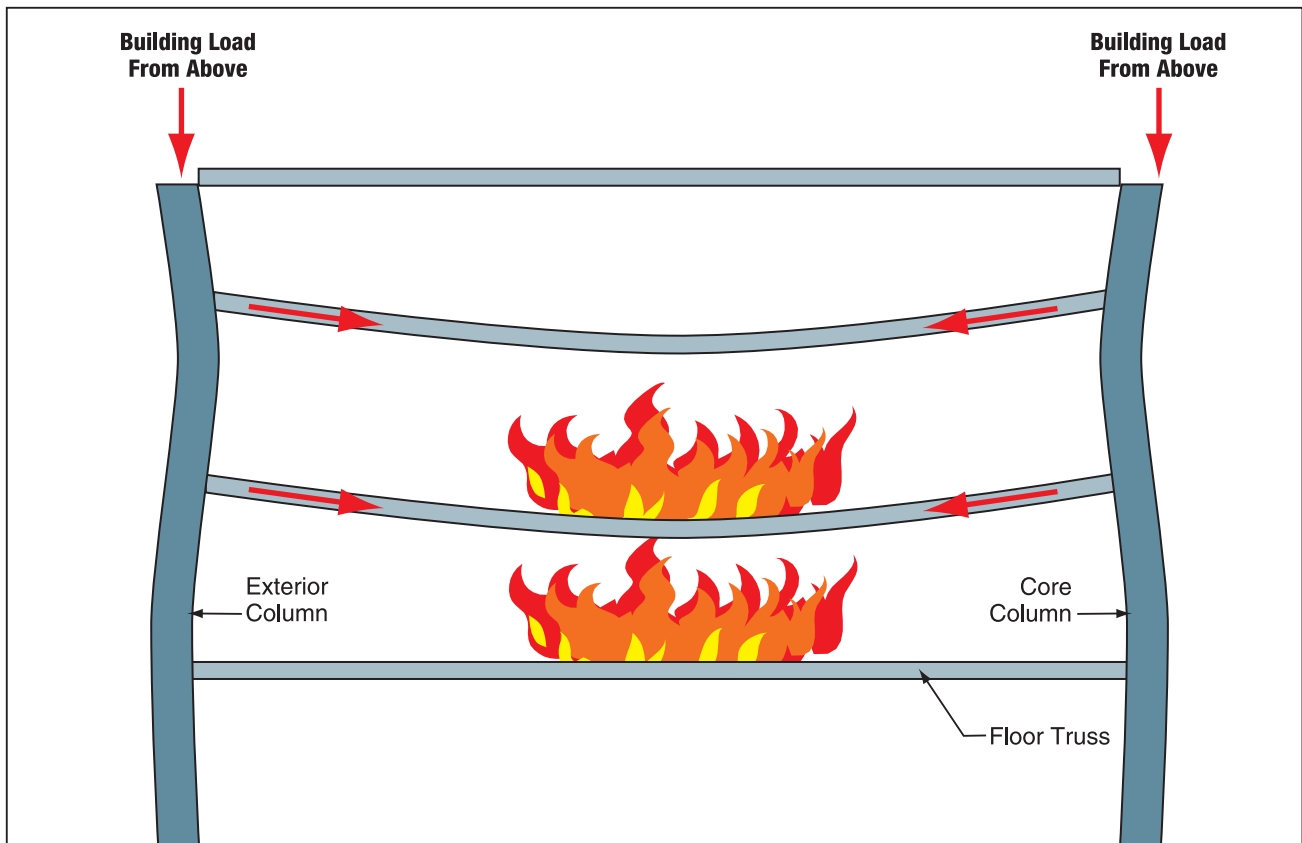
Catenary action of floor framing on several floors initiates column buckling failures.
